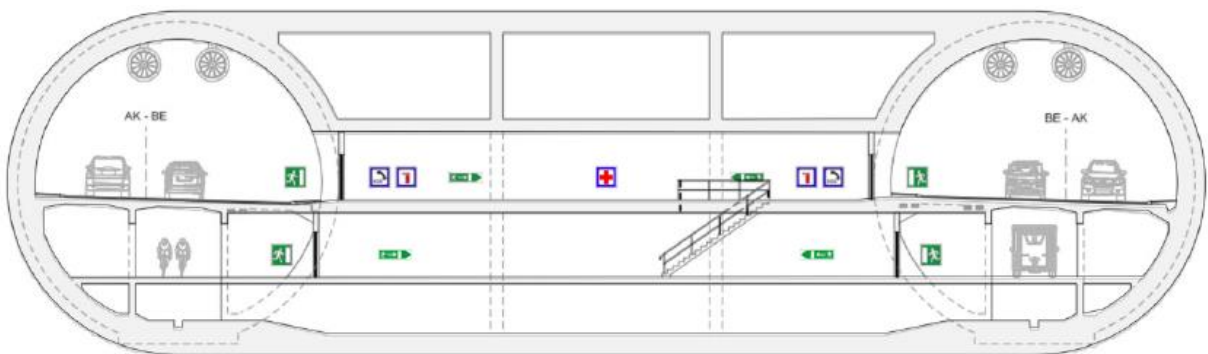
An overlook into Submerged Floating Tunnel Bridge (SFTB) Design (Canh Vu).
